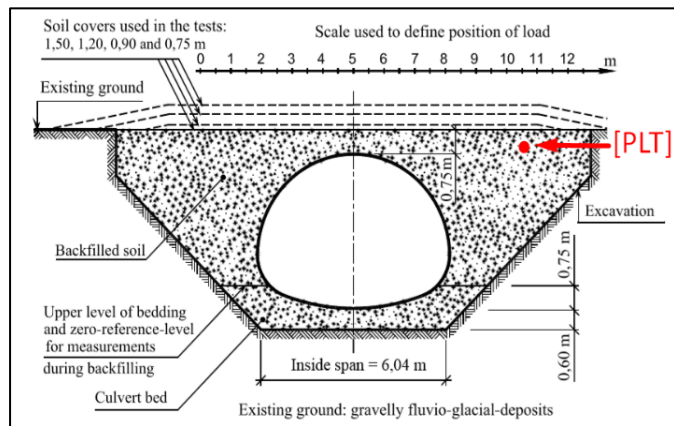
Geometrical properties of the culvert in the excavated pit, showing the plate loading test denoted as [PLT] (From Petterson. L, 2007)
